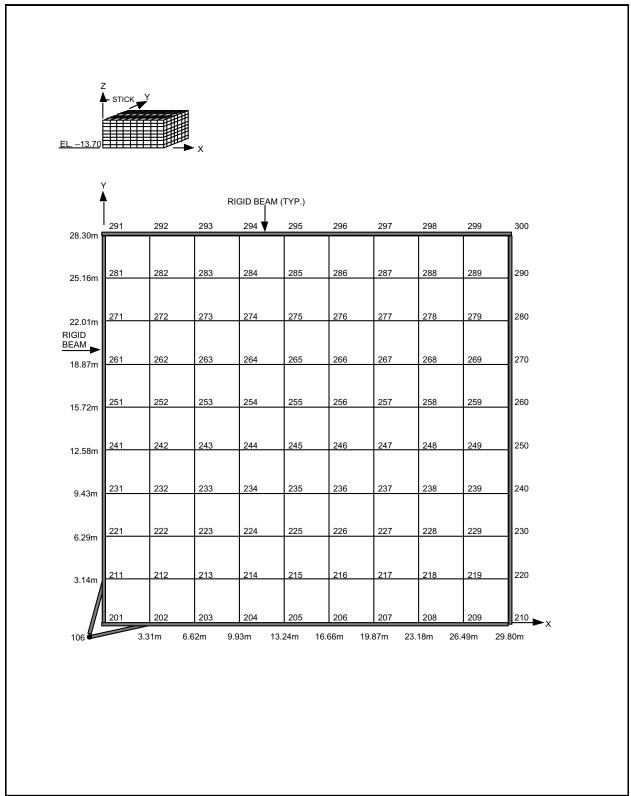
A-16 UB Case: Nodal Points at Elevation -13.70m
